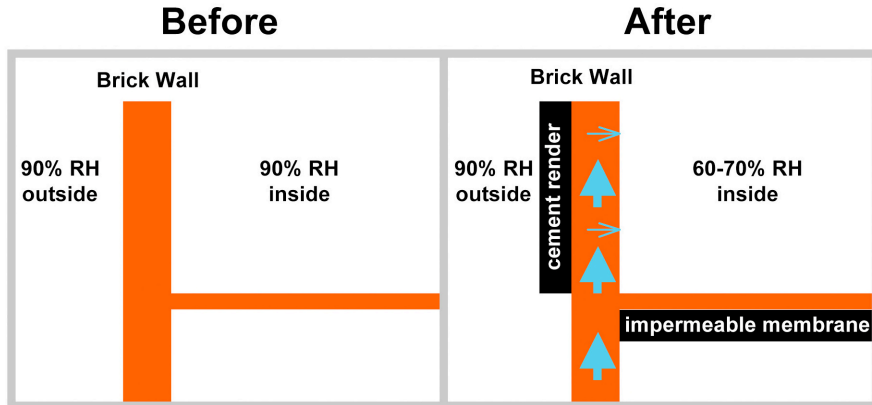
Cross section diagram of brick wall at Madame John's Legacy showing the situation before and after a 1998 renovation added a cement render to the exterior, an impermeable membrane to the floor and air conditioning to the ground floor (not to scale). Salt weathering of the interior brick was a notable problem starting in 2002 with the likely path of moisture transport outlined with blue arrows.
